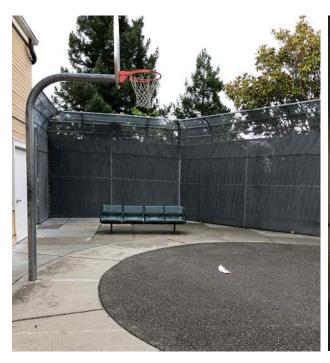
Willow Rock Outdoor Play Area, Reference Floor Plan Key Note #3
